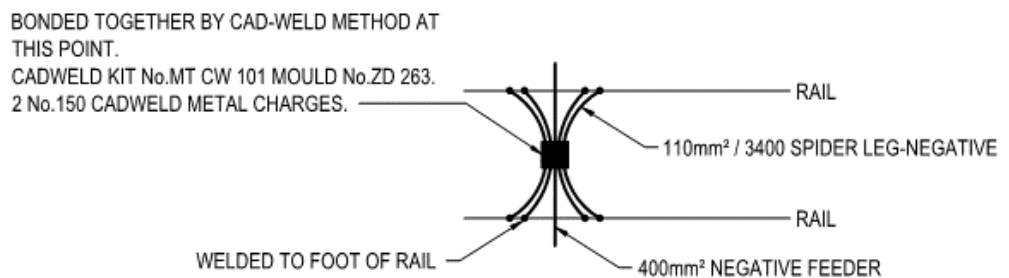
Typical Negative Feeder Connection Detail
